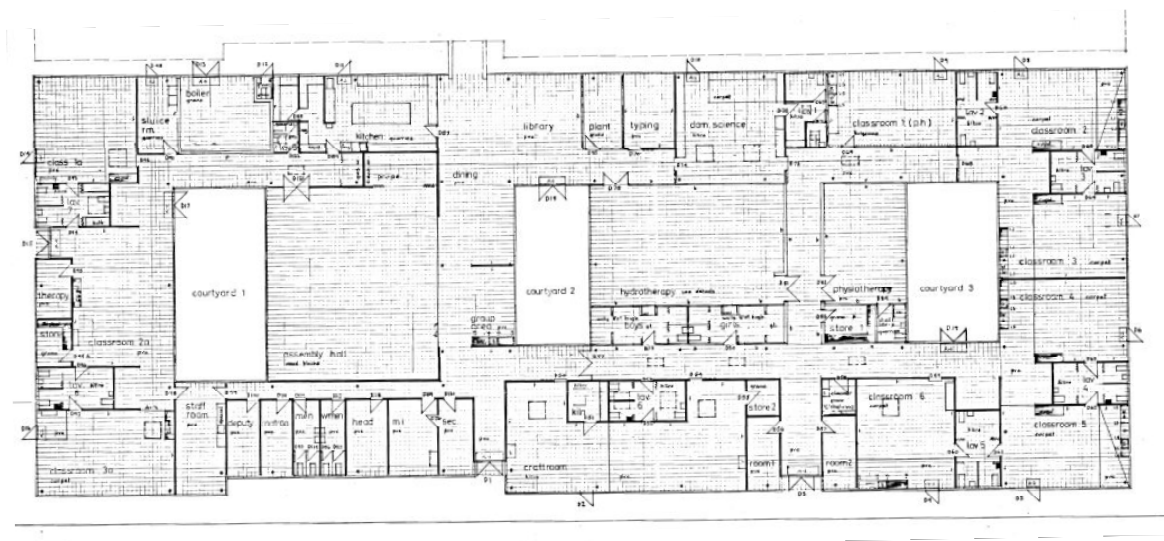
Architect's plan of original school layout, teaching and hydrotherapy block (1969)
